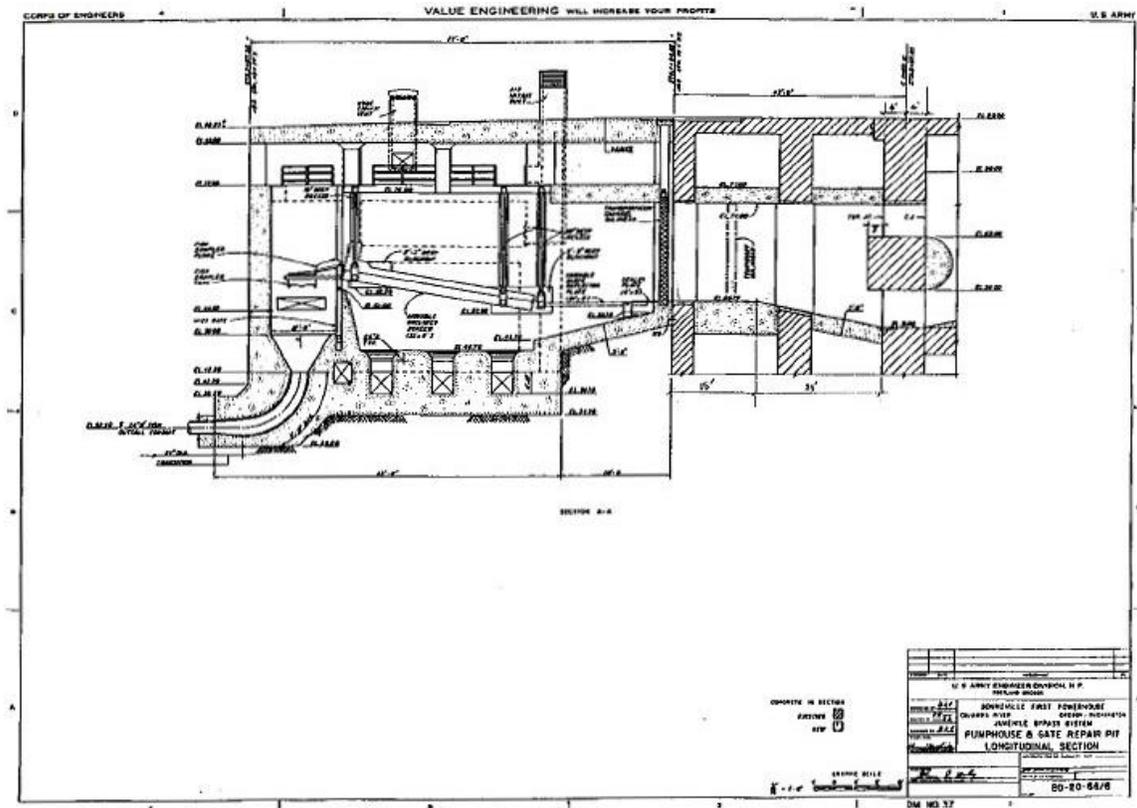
Juvenile Bypass System Pumphouse and Gate Repair Pit Longitudinal Section
